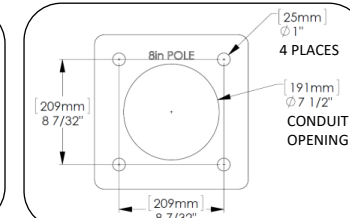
Anchor install detail, 7.6m or 9.2m pole
